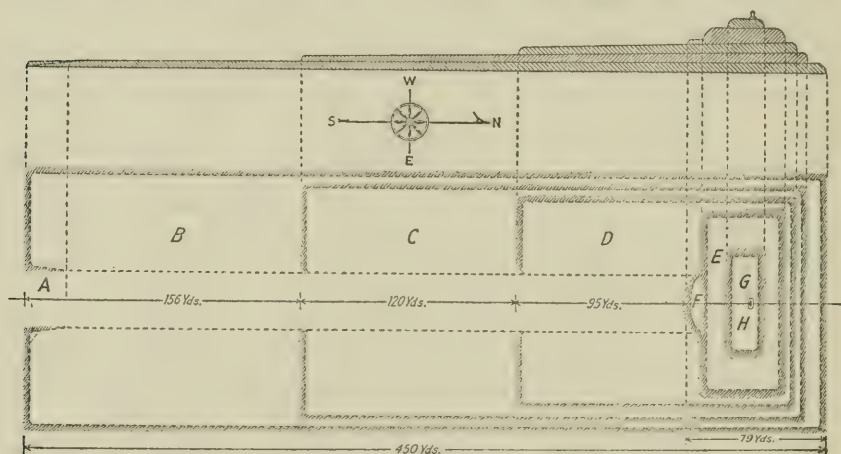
Plan and elevation of Wei Yang Kung Palace foundation-mound, Old Ch'ang-an.
